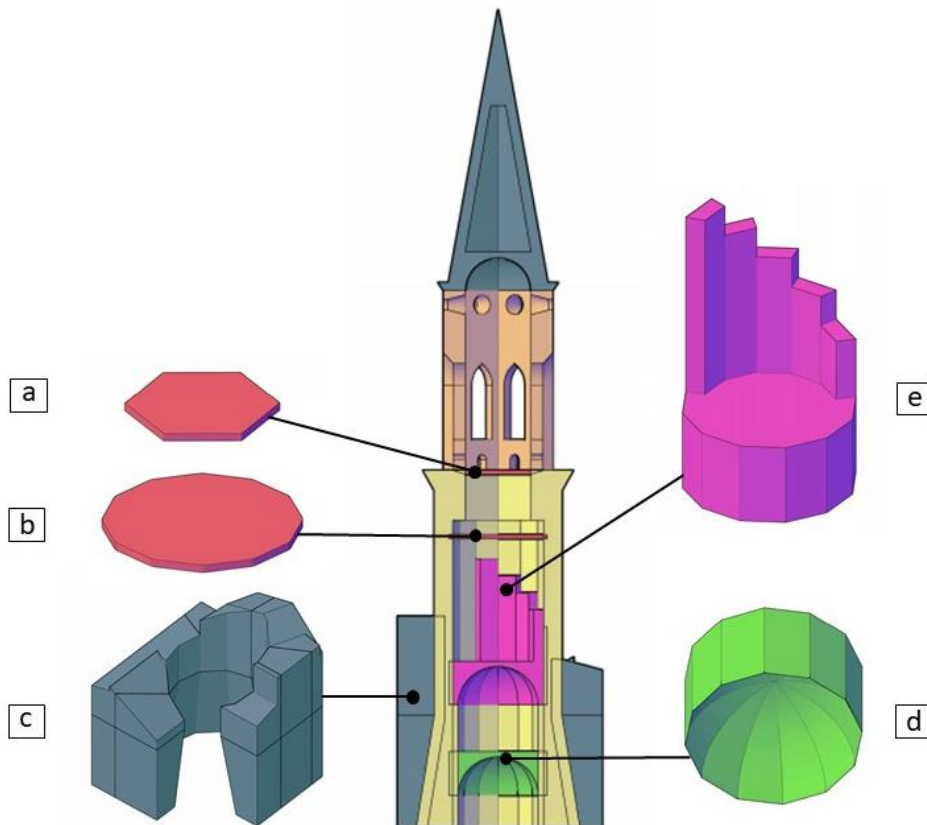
Section of the 3D AutoCAD model: (a) concrete floor, (b) rigid floor simulating the effect of the metal structure, (c) adjacent buildings, (d) lower vault of the shaft, (e) second vault of the shaft and stairs.
